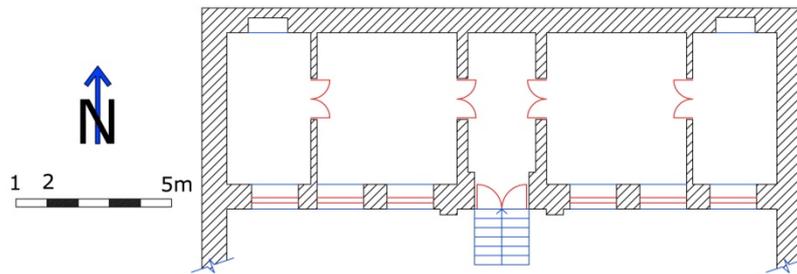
Ground floor plan, Source: Kasmaei 2005, p.86 (my drawings)
